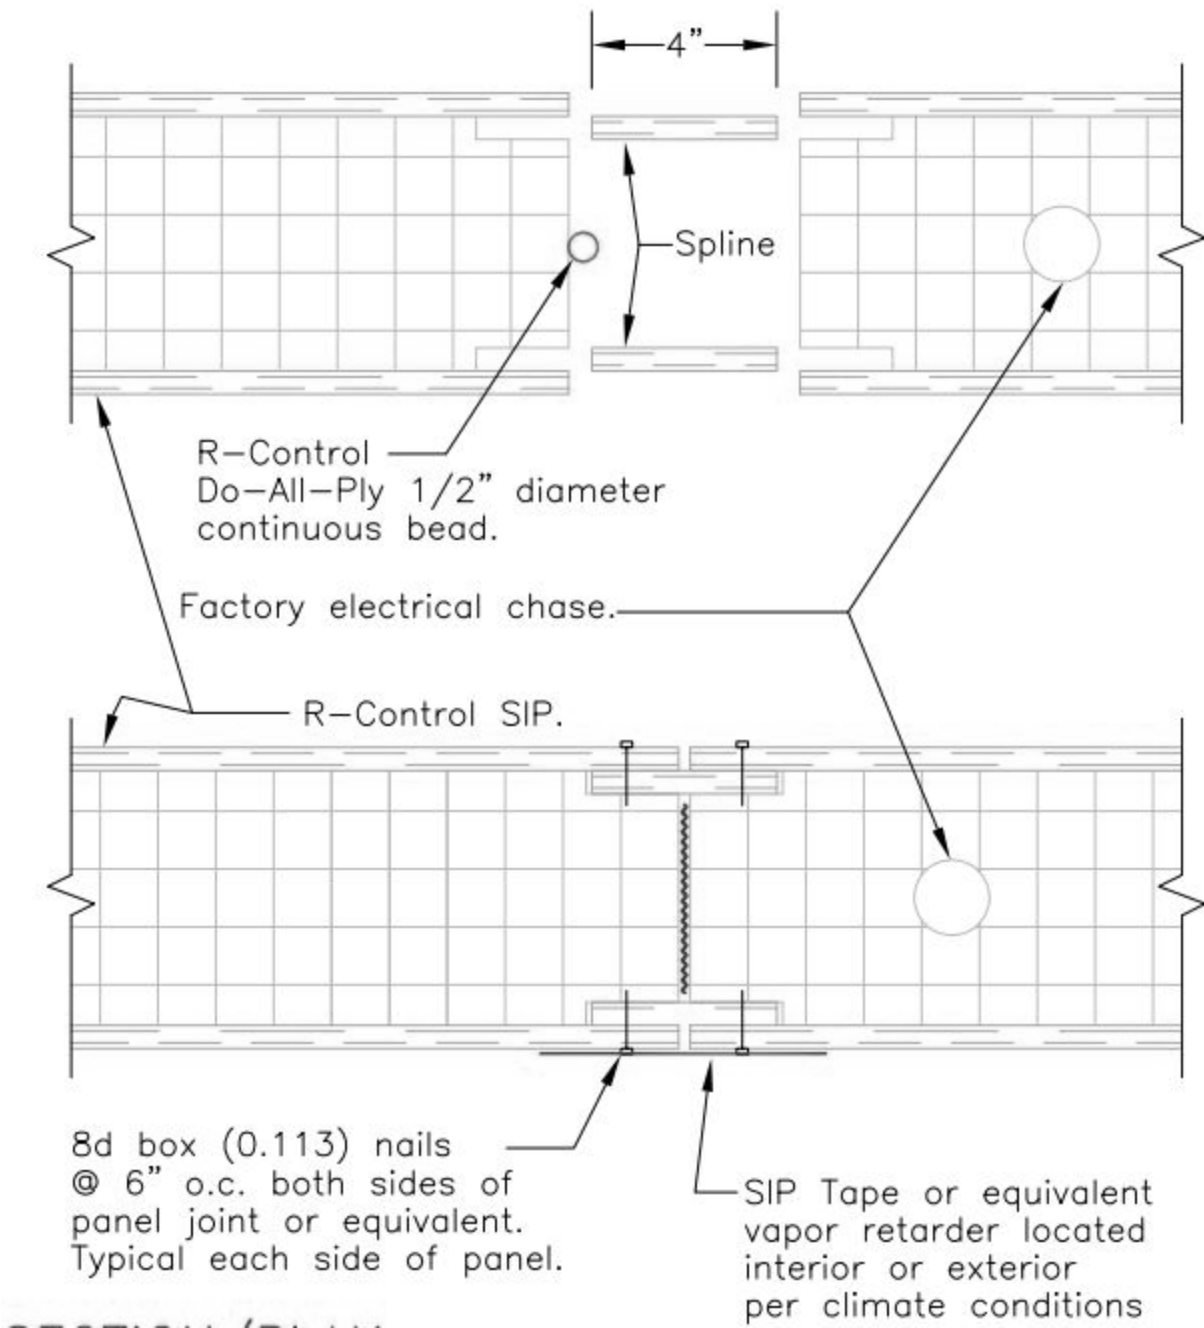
Foam Cutout + OSB Spline Wall Connection Method
